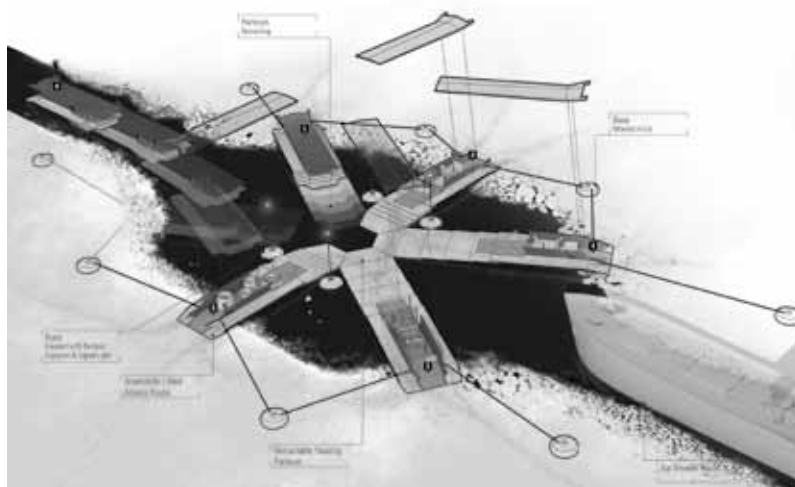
Axonometric of Scheme in ‘frozen state’ showing flexible mooring, retractable floating pontoons and bridge configuration creating a crossroads.
